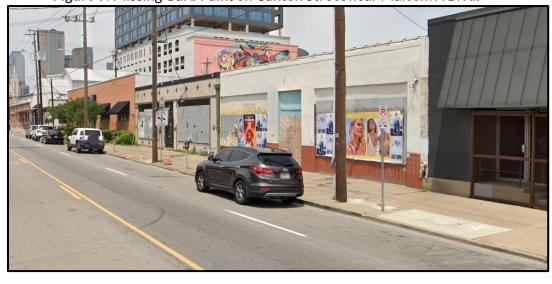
Missing Curb Paint on Canton Street near Malcom X Blvd.
